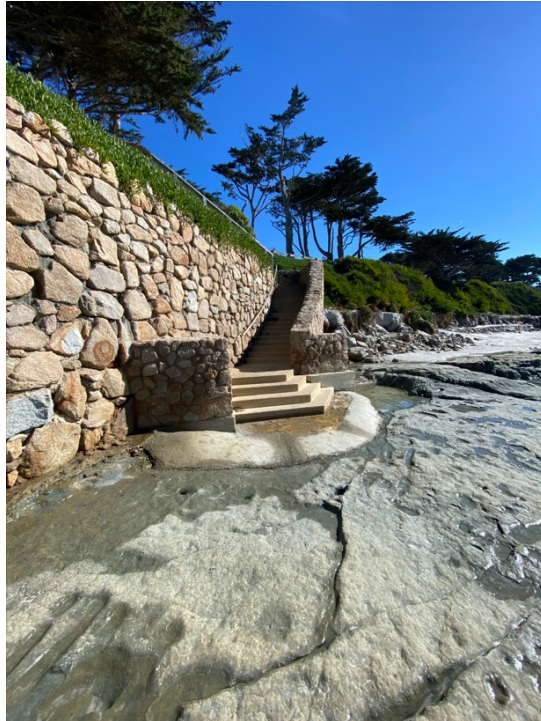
shows Stairway ST6 is located south of 10th Avenue. The base of the stairs was buried in beach sand.
